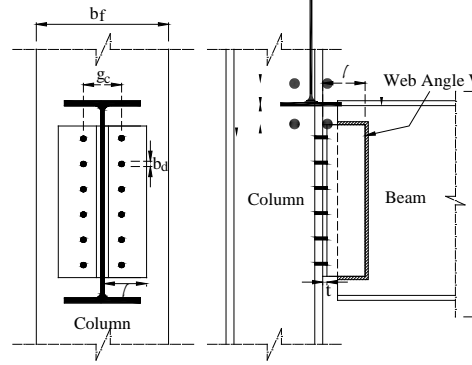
Configuration of Welded/bolted double web angle connection test specimen
